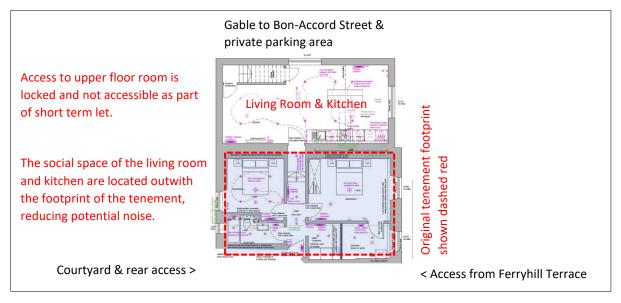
General flat layout with ground floor access to short term let and social spaces outwith tenement footprint
